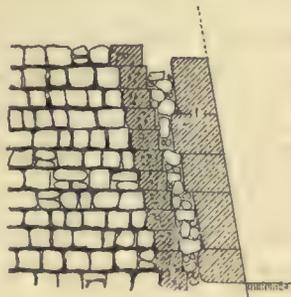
G. 2130, section of western wall. Scale 1 : 100.
